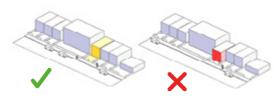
Building front alignment If the building front exceeds the frontage of its neighbour, it could have a negative impact on the character of the street.
